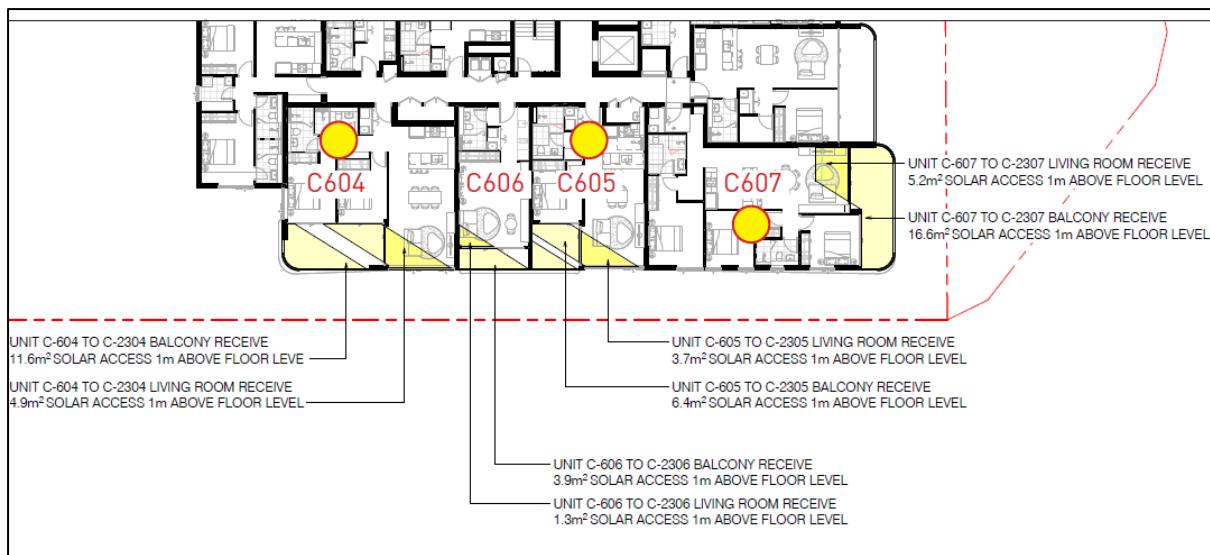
Solar penetration diagram; Building C at 9am 21st June (Source: PTW Architects)
